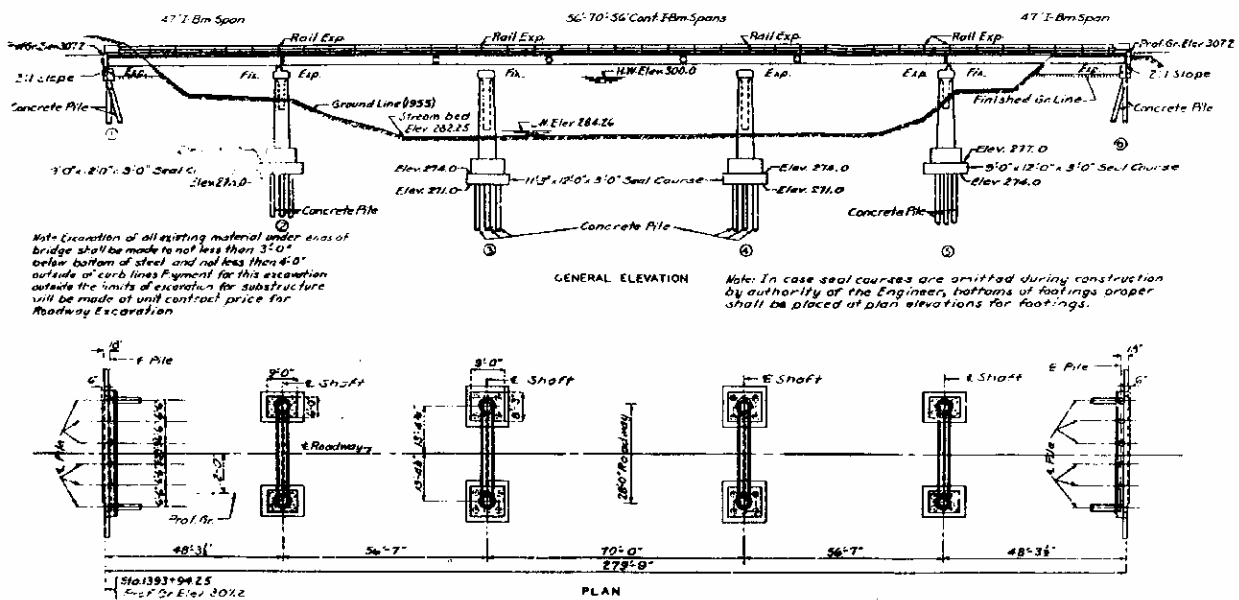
Bridge General Elevation (Old Wahite Ditch Bridge)
